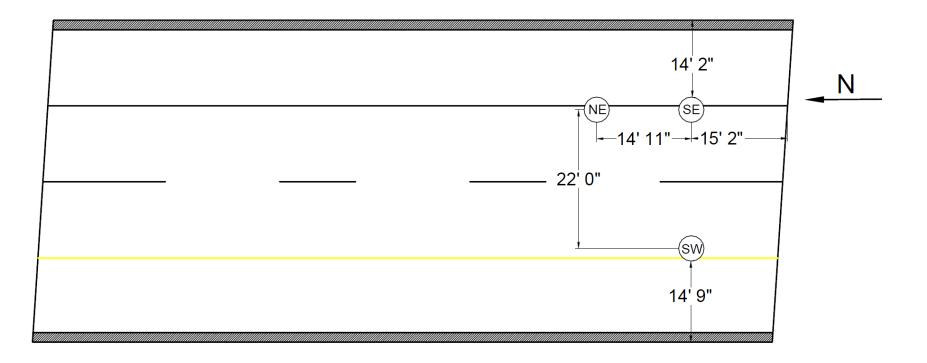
Sensor locations on 8200 South northbound conventional concrete deck.
